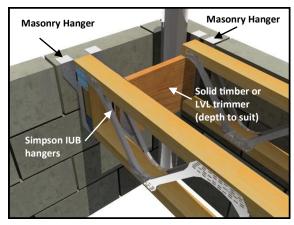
Fixing Around Soil Vent Pipe Using Trimmer See Robust Detail E-FT-3 (11) for treatment of service void penetrating the separating floor.
